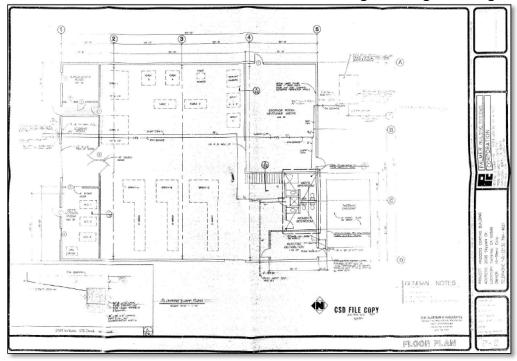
1992 Floor Plan for the Process Coating Building Showing Drywell Detail
